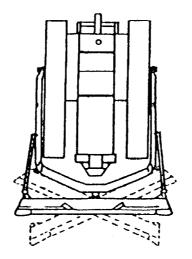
Adjusting the Diagonal Angle of Blade
